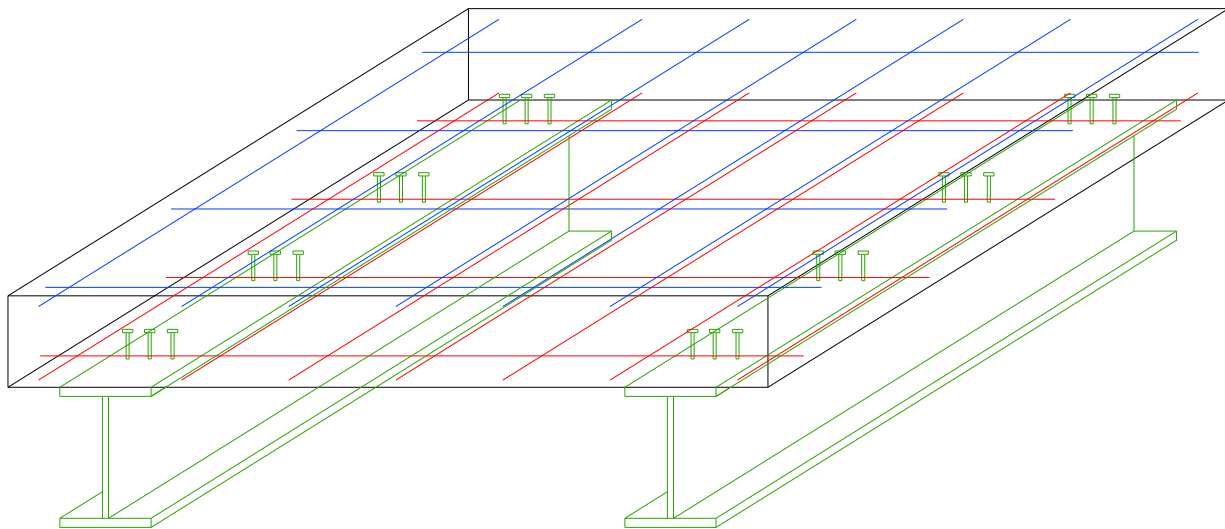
Typical bridge deck slab using empirical design method. Blue signifies top reinforcement, red signifies bottom reinforcement
